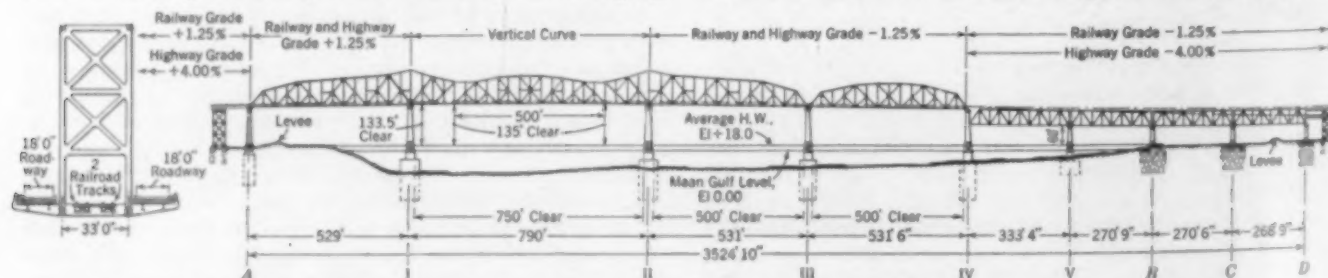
NEW ORLEANS BRIDGE—CROSS-SECTION OF THROUGH SPANS, AND ELEVATION FROM DOWNSTREAM
